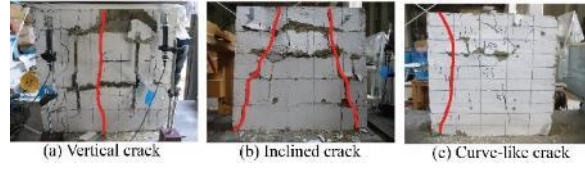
Typical failure patterns of RE wallettes observed under compression loading
